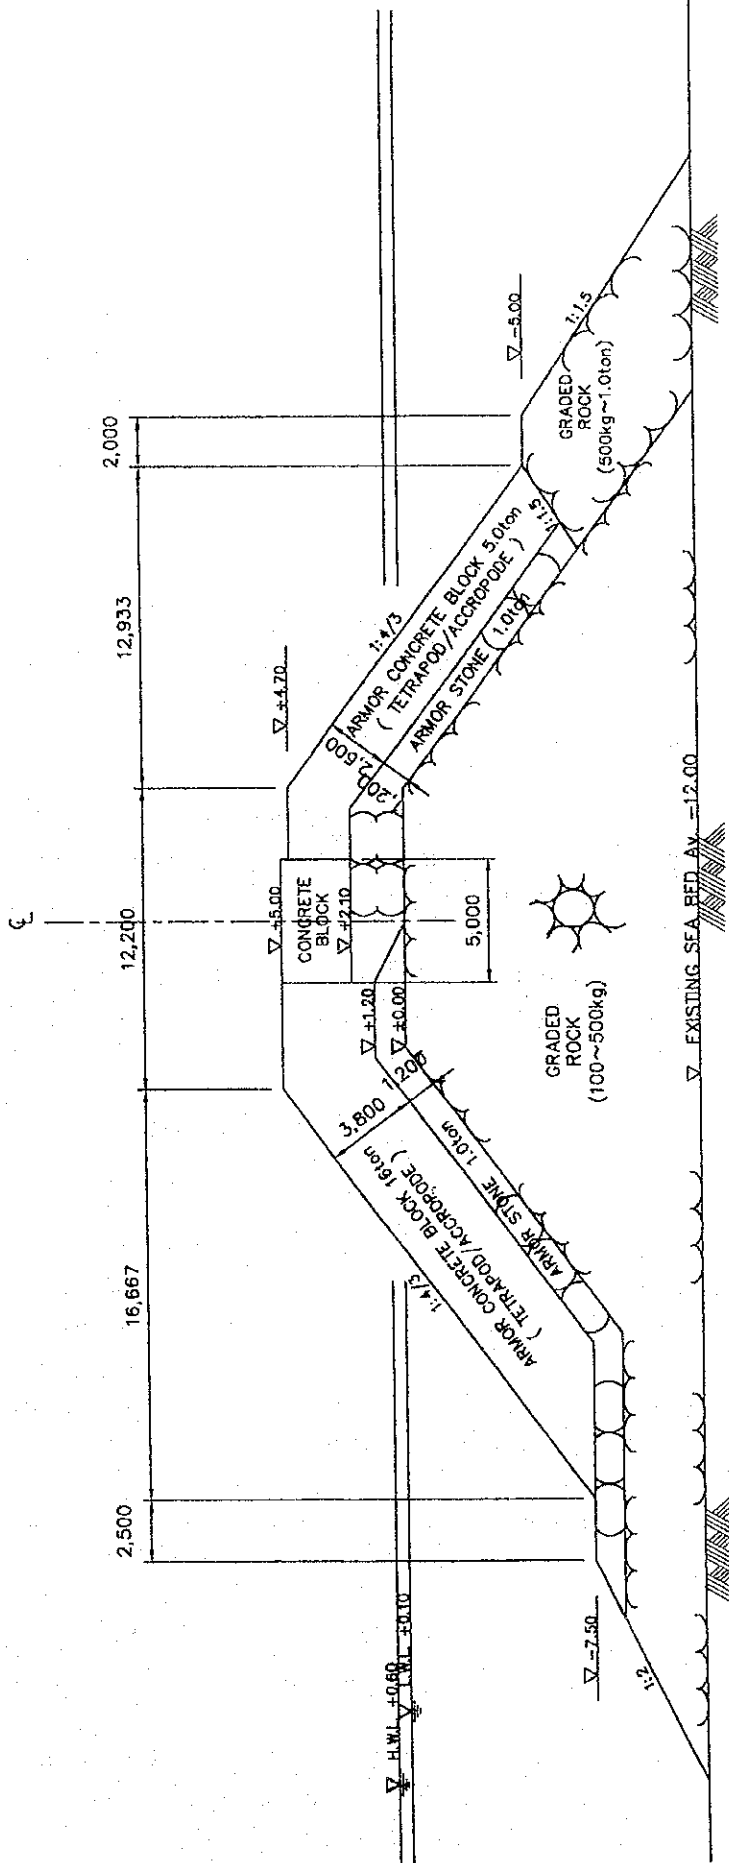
Typical Cross Section of Inner Breakwater
